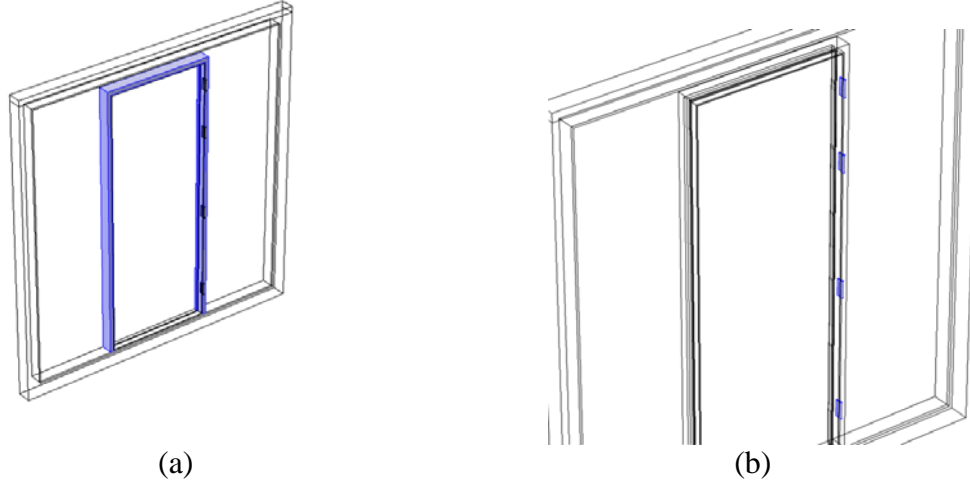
(a) Wooden Door frame, (b) Steel hinges
